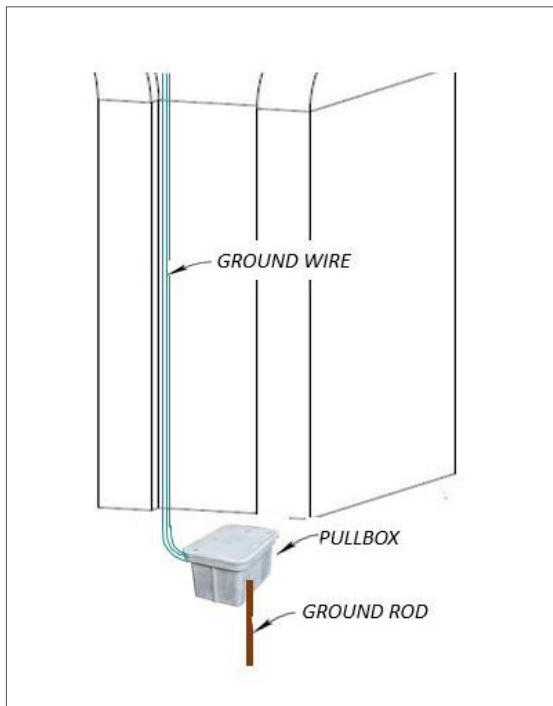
GROUND WIRE ROUTING SECTION VIEW
